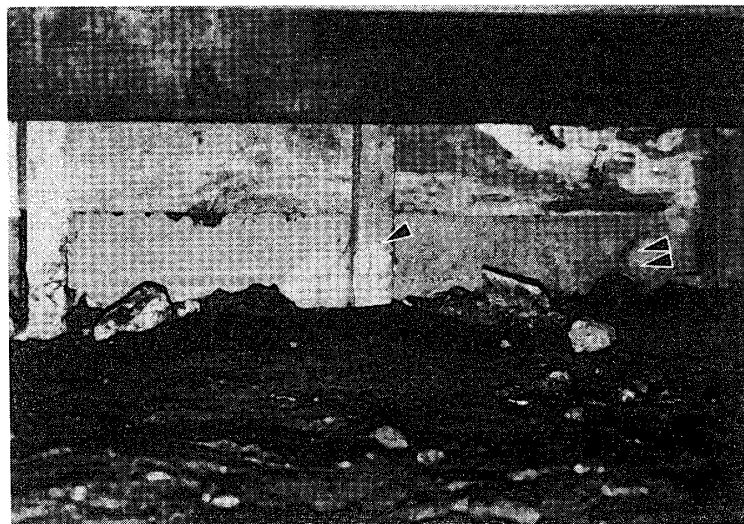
Hyphae (▶) and hyphal strand (◀) on the wooden frame left at the construction of a concrete storage.
